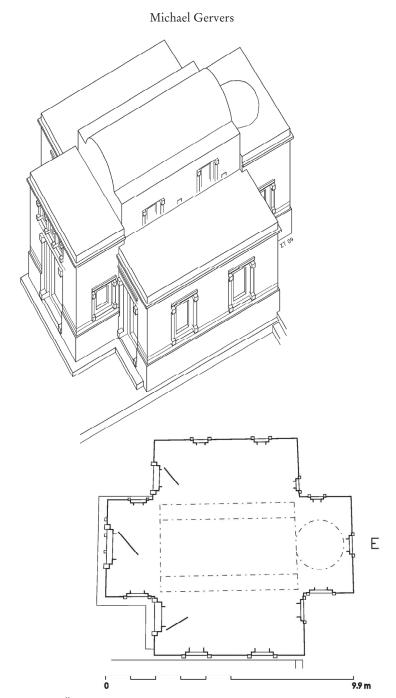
Church of Žämmädu Maryam, Wällo; isometric drawing and floor plan by Zara Thiessen
